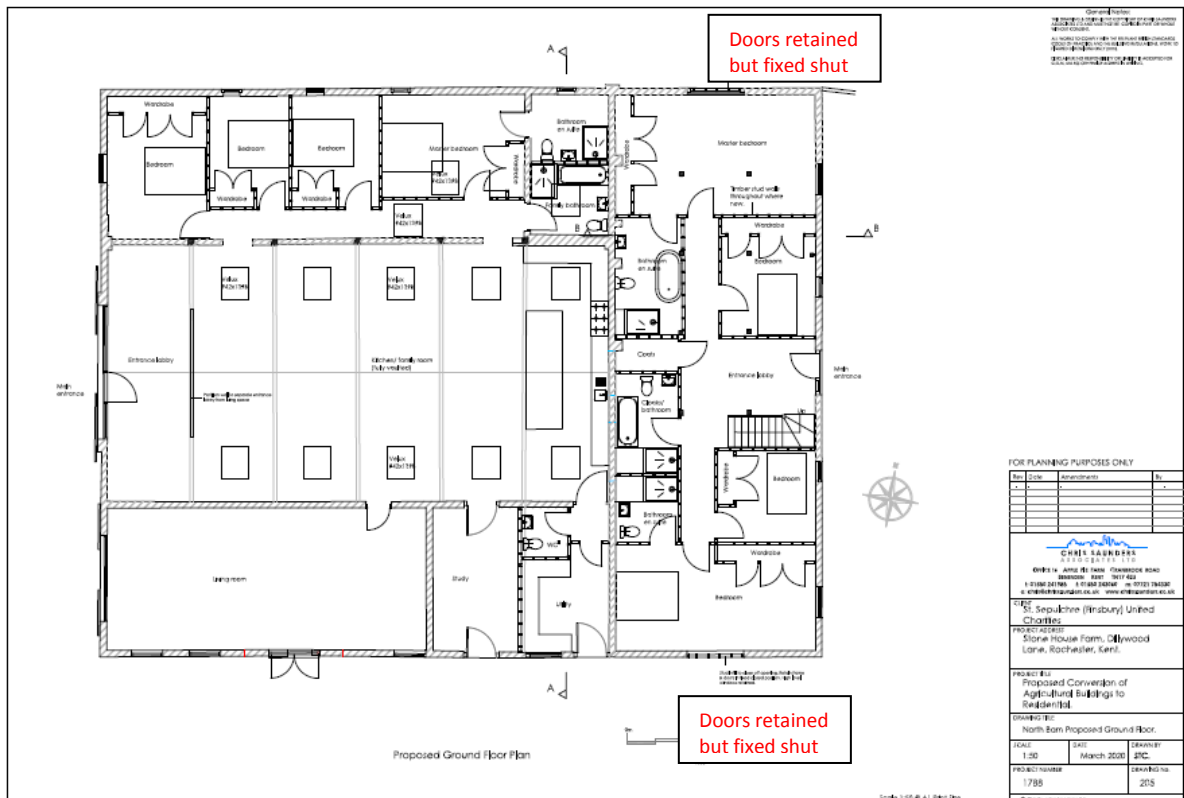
Proposed ground floor plan ©Chris Saunders Associates Ltd. drawing number: 1788/205.
